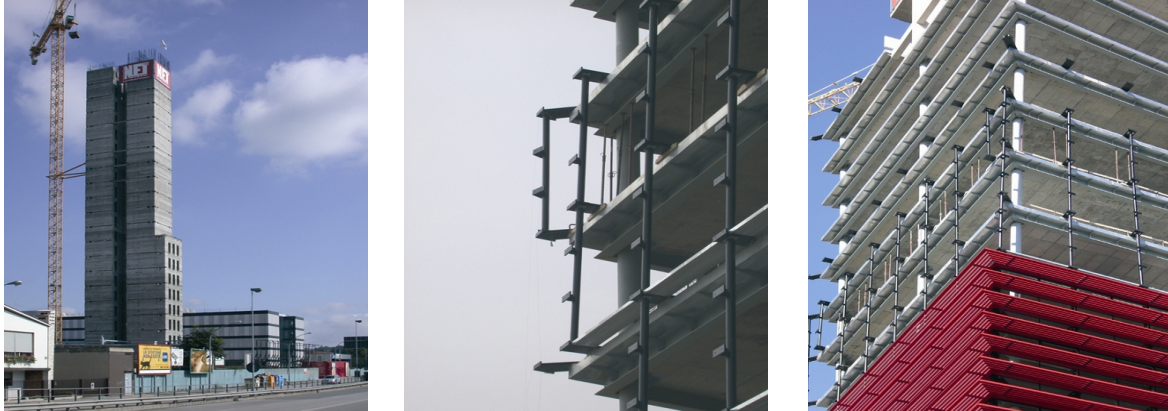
center: Agbar tower, Barcelona, J. Nouvel – A construction phase of the external concrete structure of the tower.
